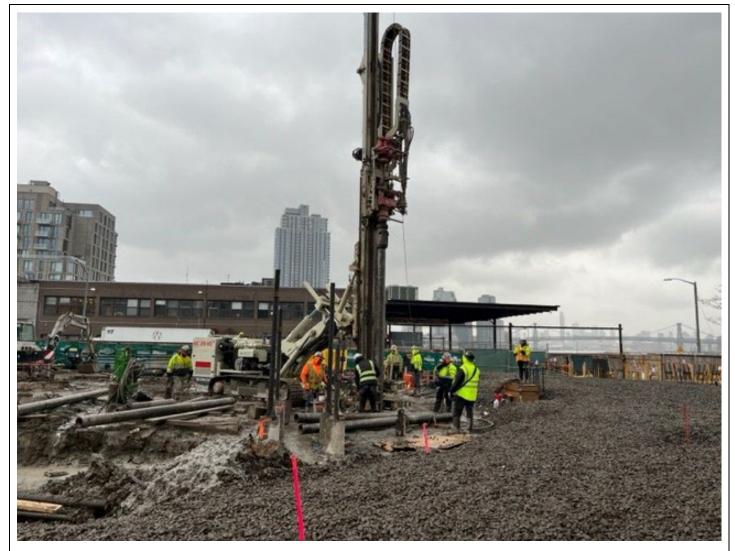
View facing west, CCJV installing foundation footing in grid cell SC-6.
